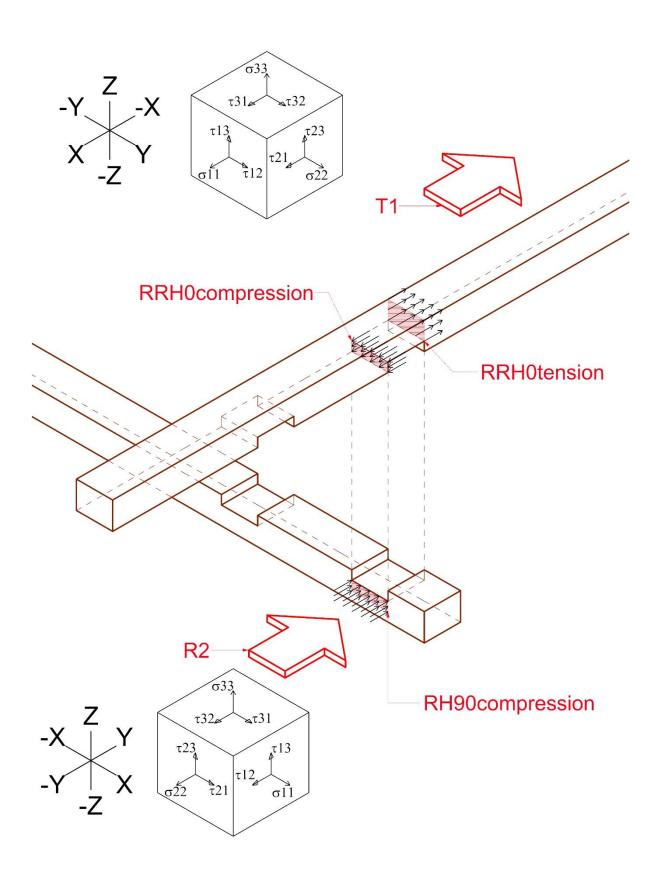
Roof Rafter Head Axial stresses : Crossing rafters T1-R2
